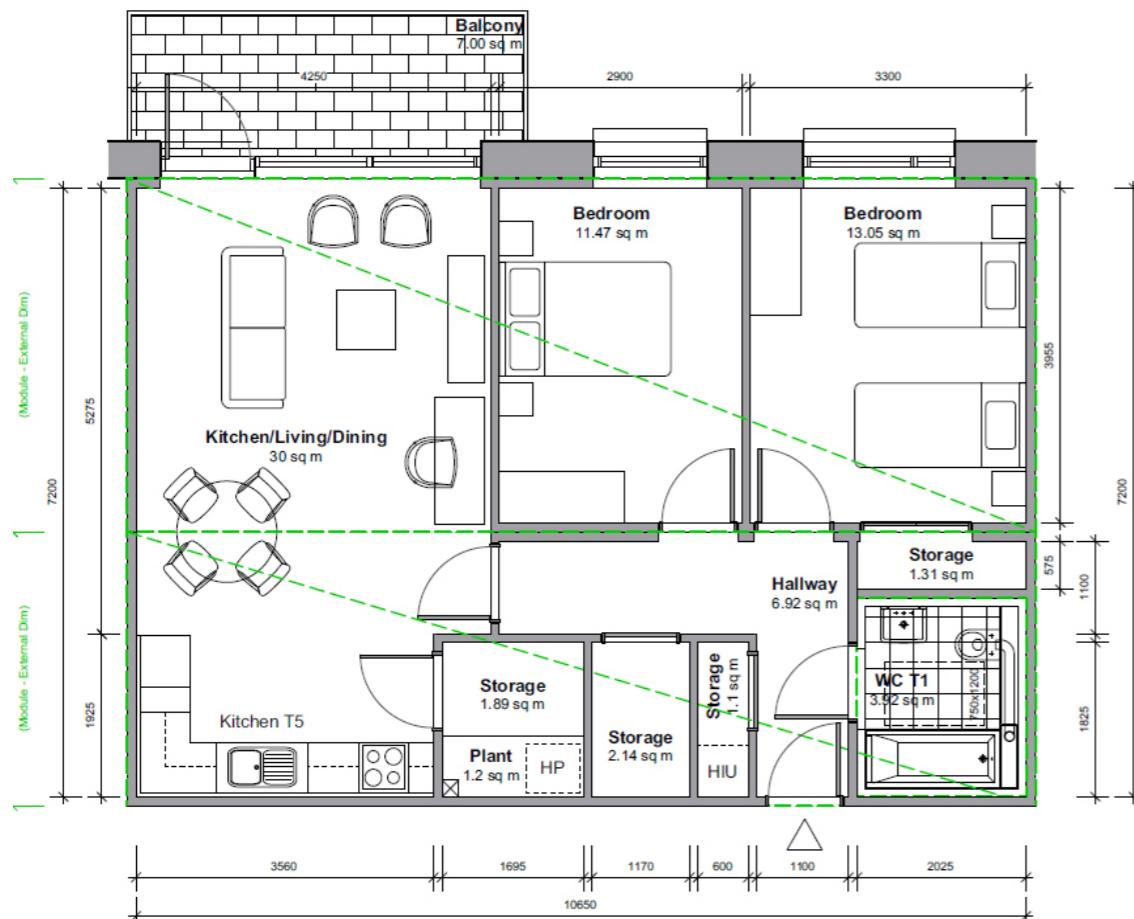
Apartment Type A-2B4P-1 Two Bedroom Apartment
